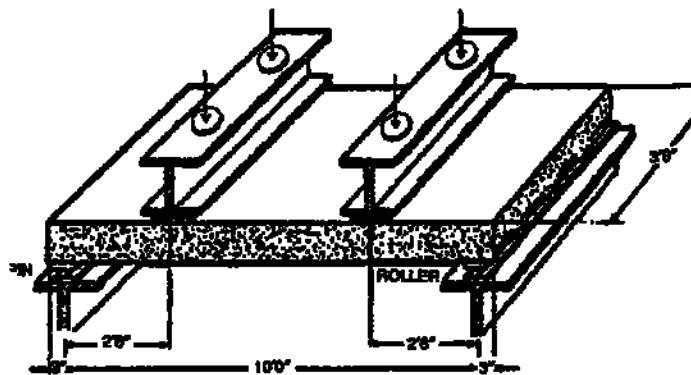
TEST ASSEMBLY FOR SECTION 4.8 WITH 10-FOOT SPAN
